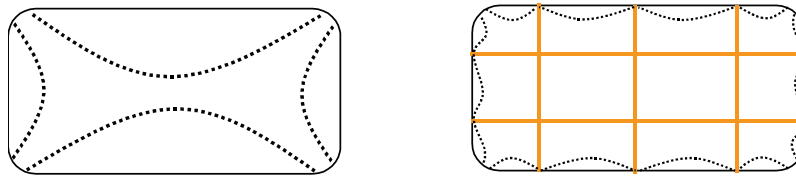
Confinement of masonry members with FRP sheets and bars.
